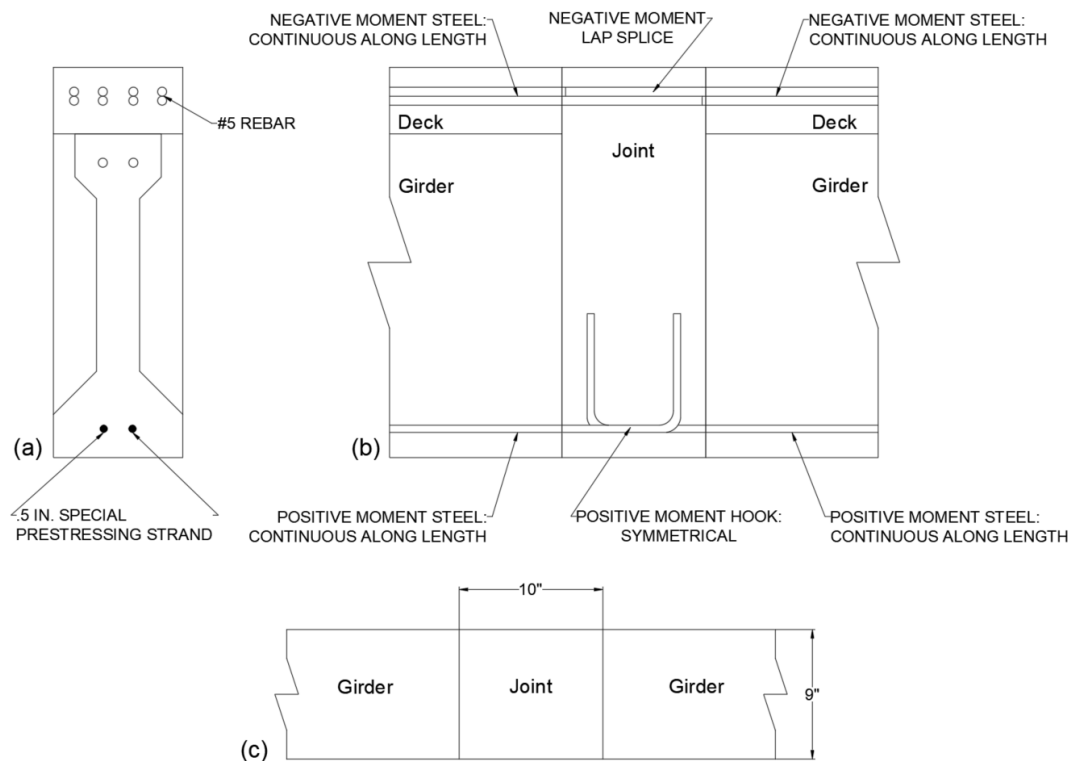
Hooked strand continuity joint cross-section (a), elevation view (b), and plan view (c)
